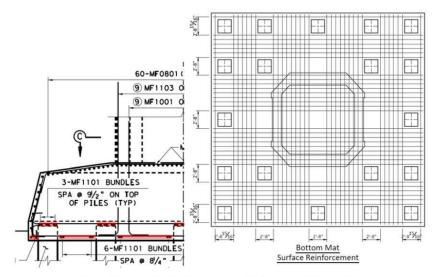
Gaps in Pile Cap Bottom Surface Reinforcement in Between Piles
